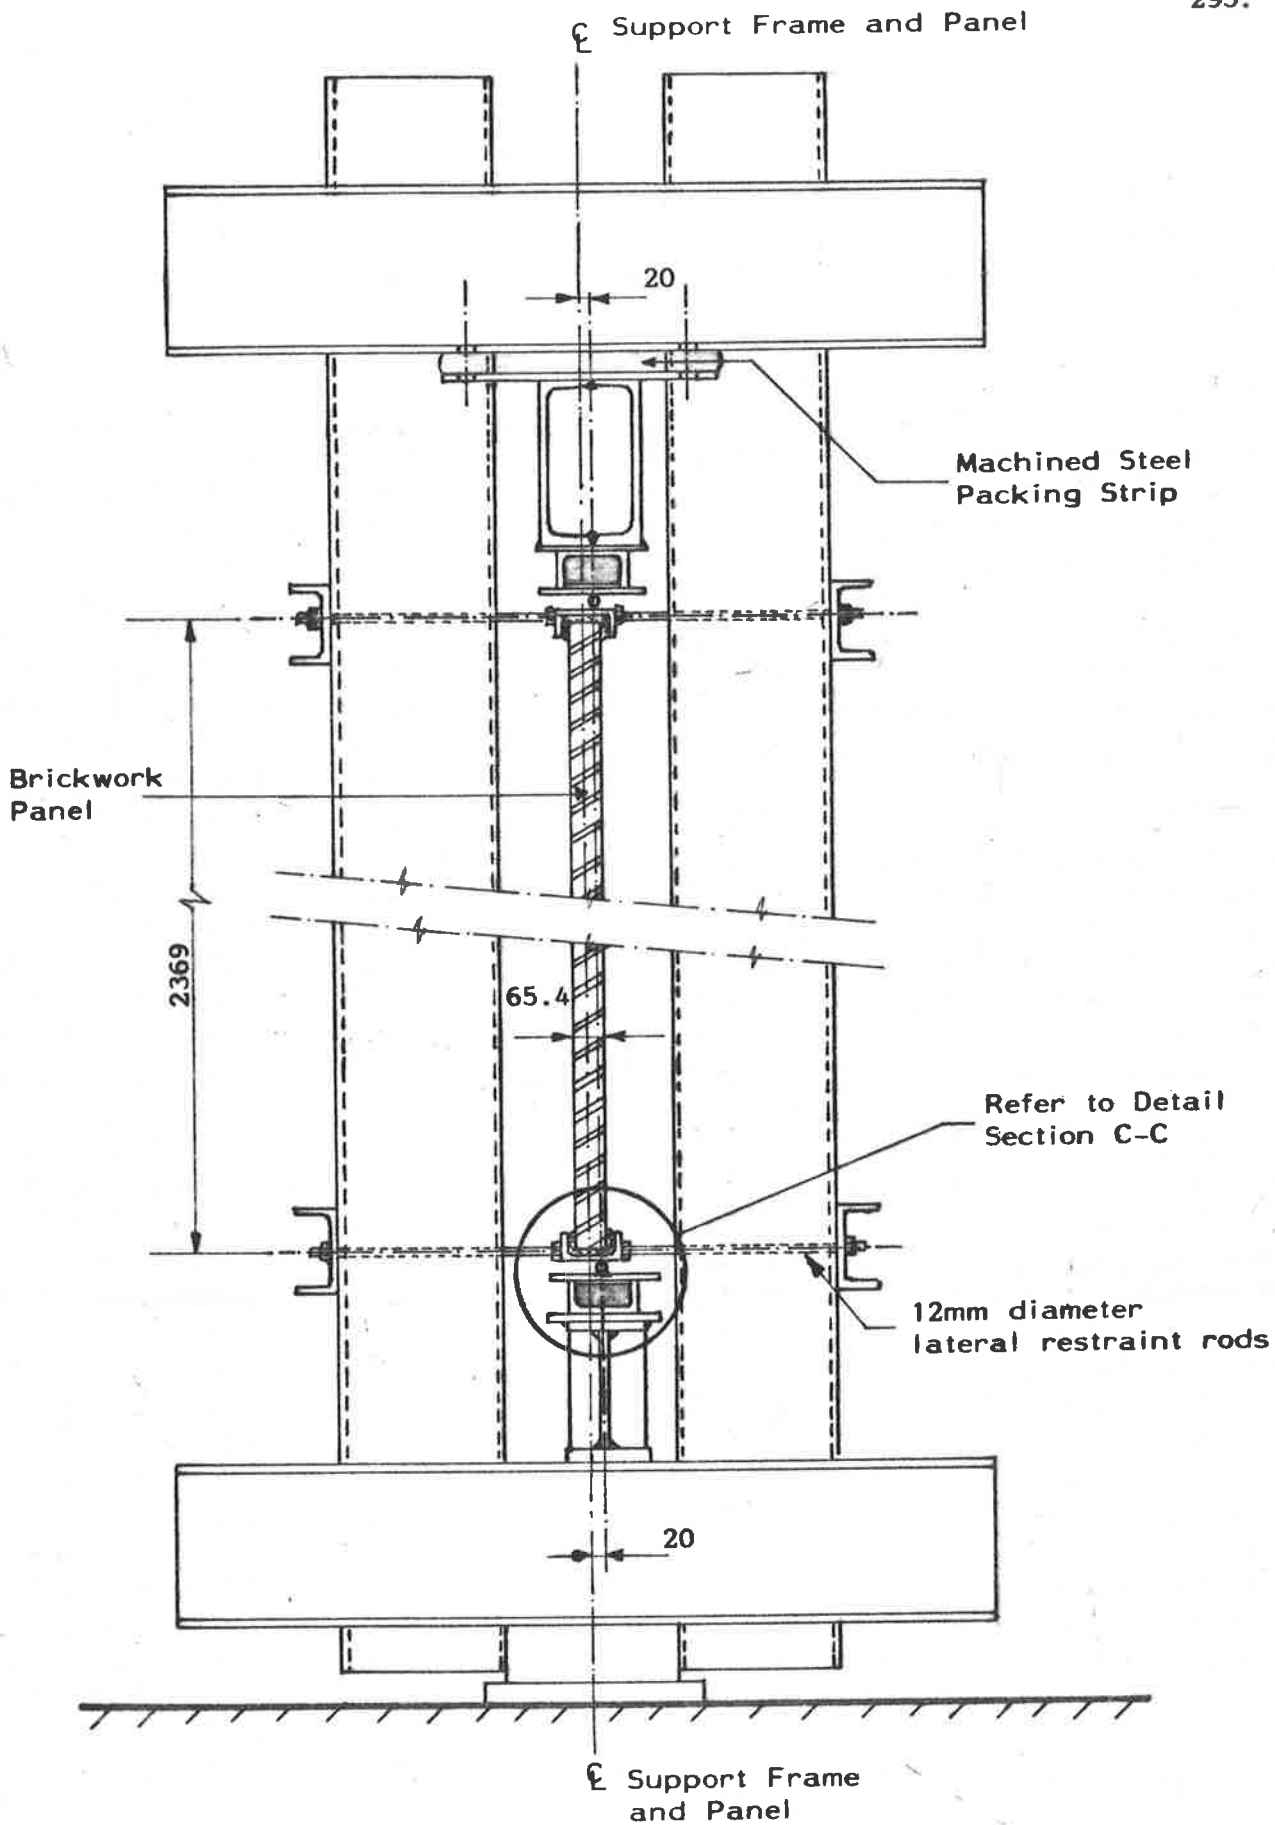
(b): Section A-A Facing South (Showing Load Eccentricity)
